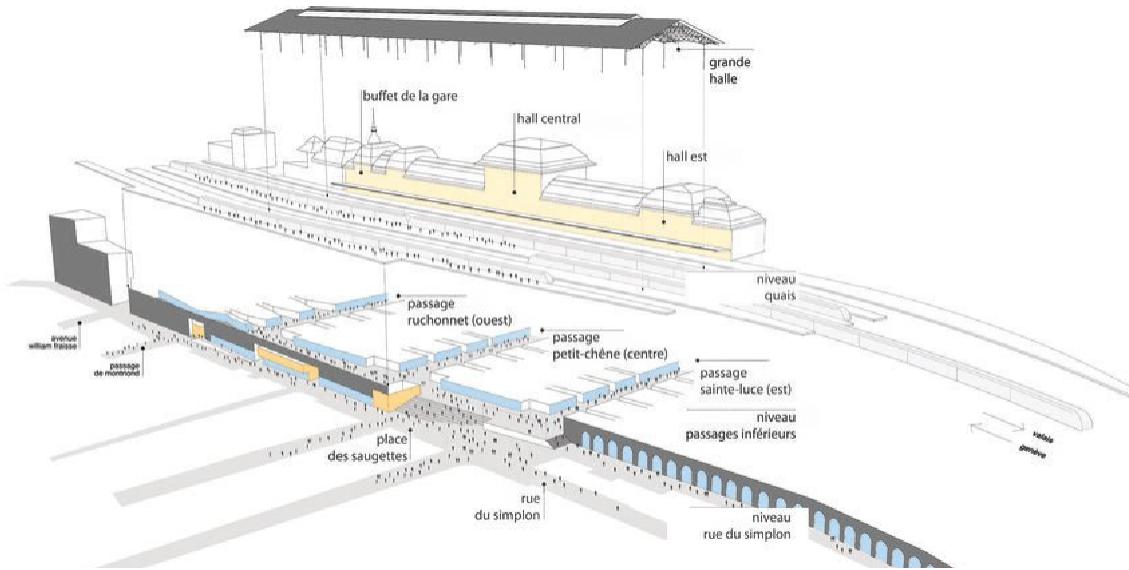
Expansion plan of Lausanne train station by 2020, with three underpasses and shopping facilities below ground (SBB, 2017).
